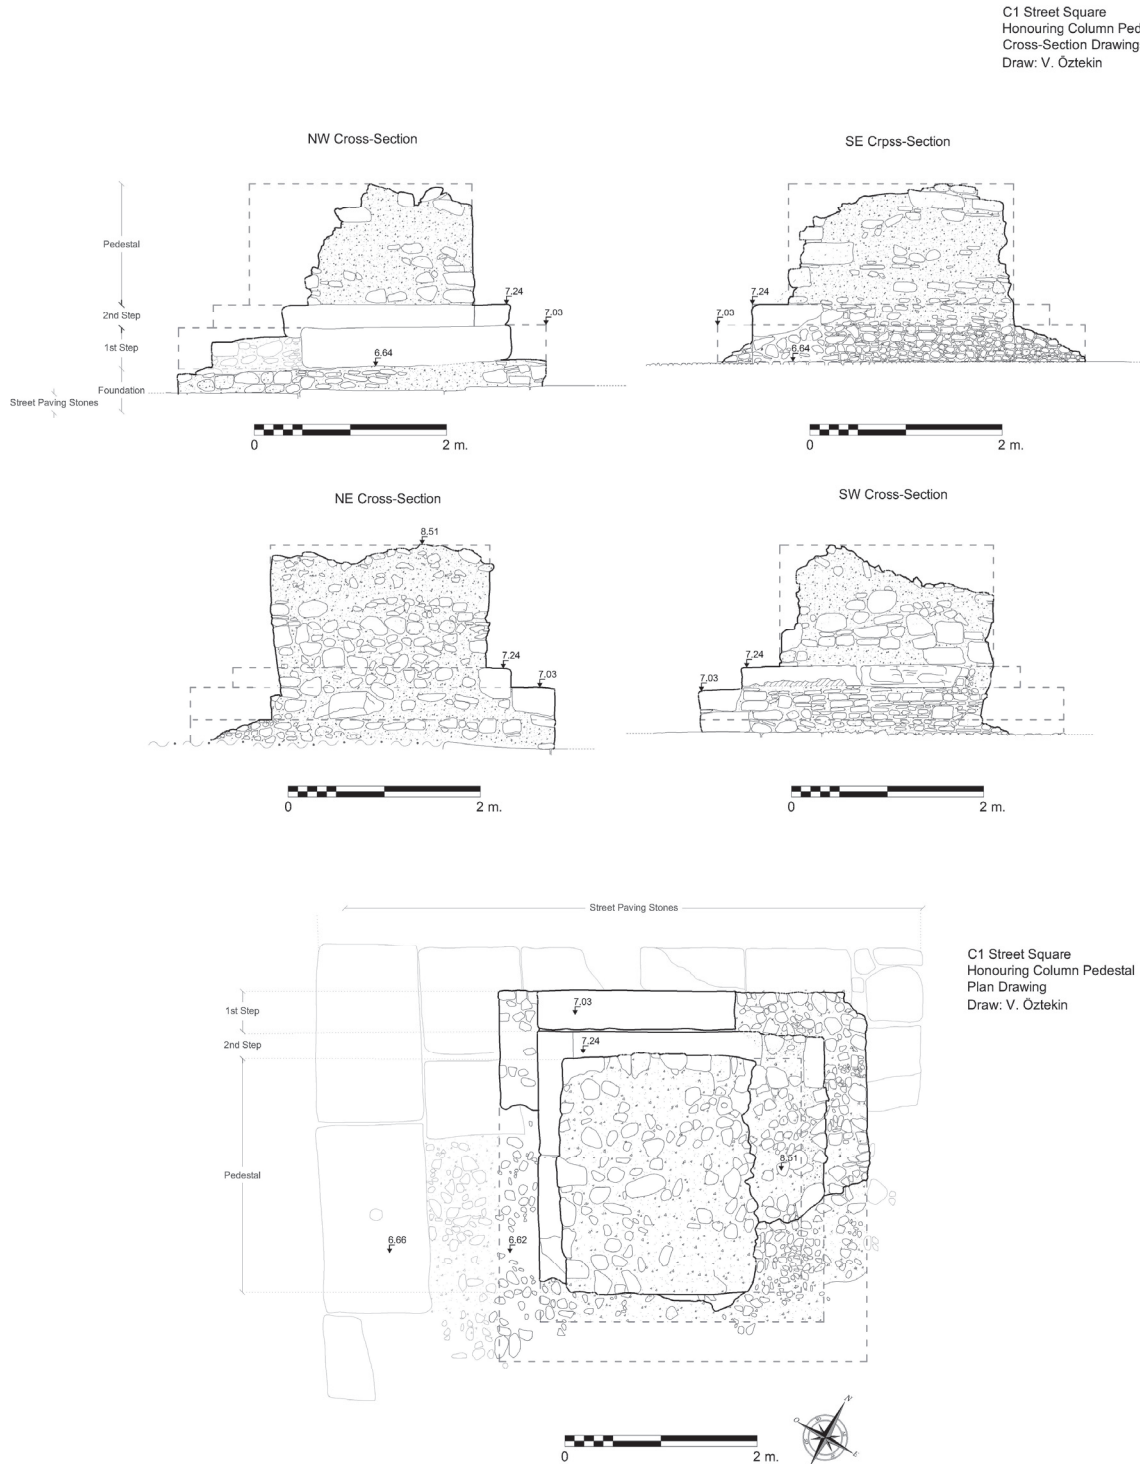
C1 Street Square, Honoric Column Pedestal cross-section and plan drawings (Drawing: V. Öztekin)
